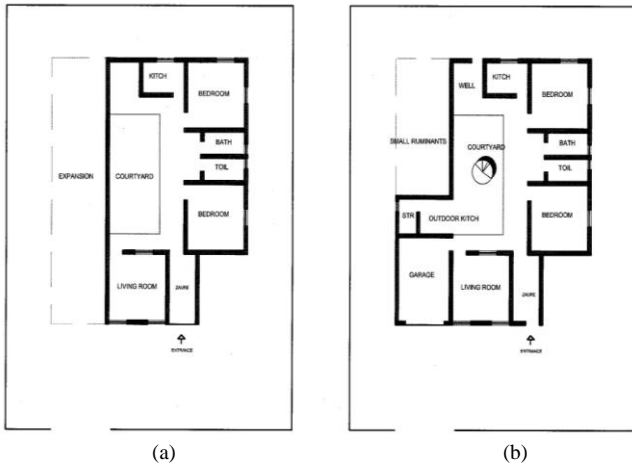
(a) A two Bedroom which is could serve as the initial house to be built by the government for relocated residents, the house consists of basic architectural elements; (b) Transitional model consisting architectural elements such as store, space for small ruminant's/ poultry, outdoor kitchen and well
